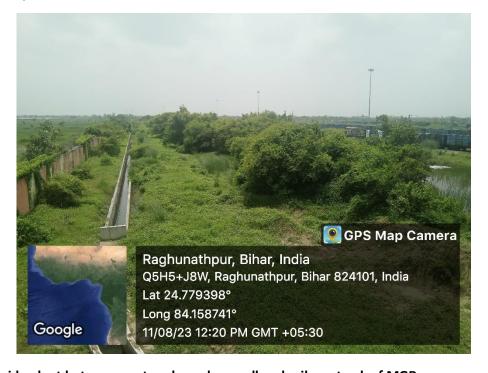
Inside plant between eastern boundary wall and railway track of MGR.
